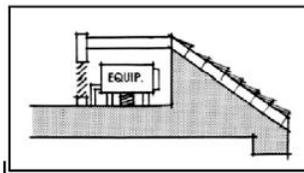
A. The following figure provides an illustration of an acceptable design used to screen roof-top mechanical equipment.
